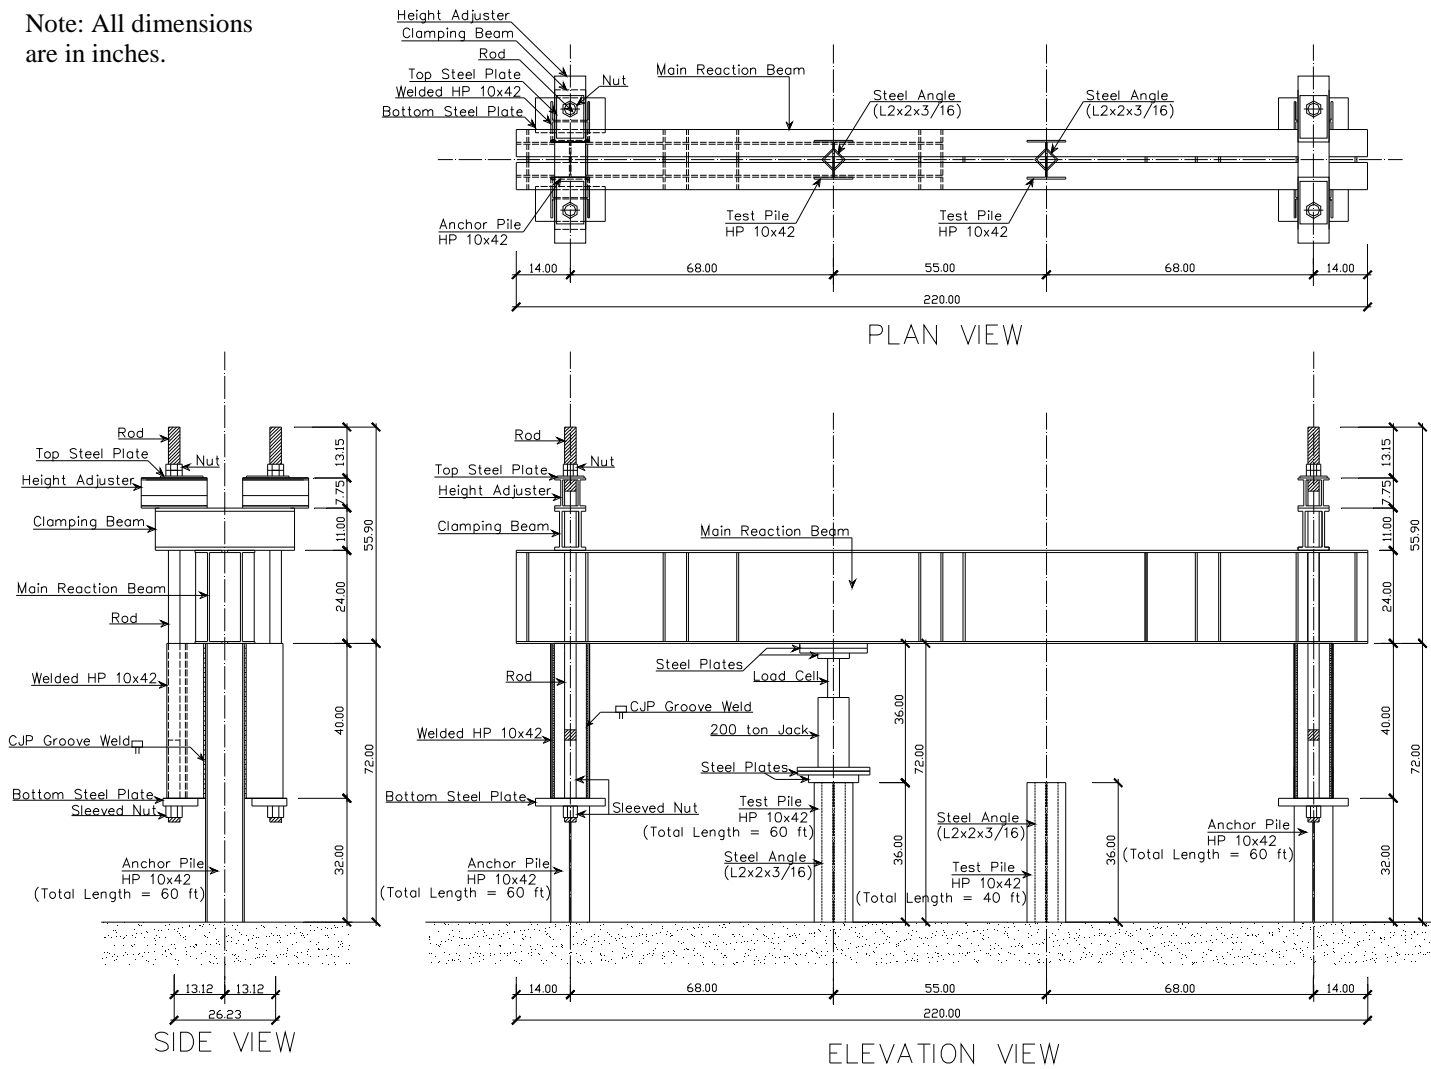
Plan, Side and Elevation Views of the Vertical Load Test Setup used for ISU6 and ISU7
